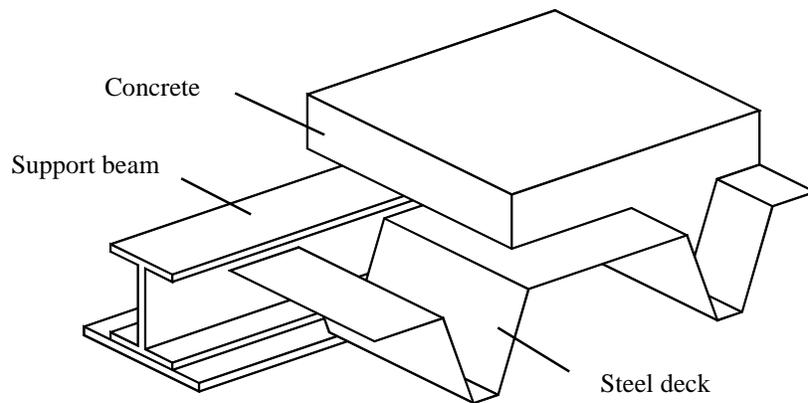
Slimflor* system (British Steel, Steel Construction Institute 1997)
